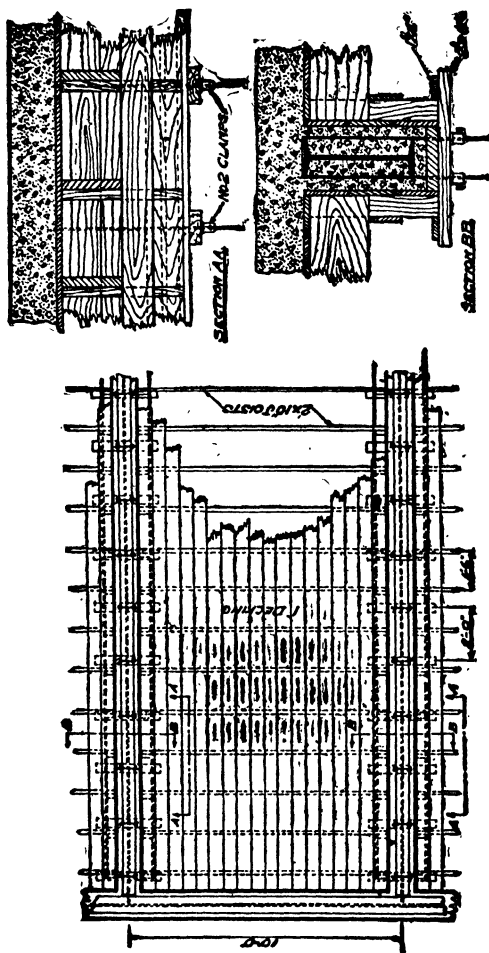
Floor forms supported on steel construction. (Courtesy Universal Form Clamp Co.)
